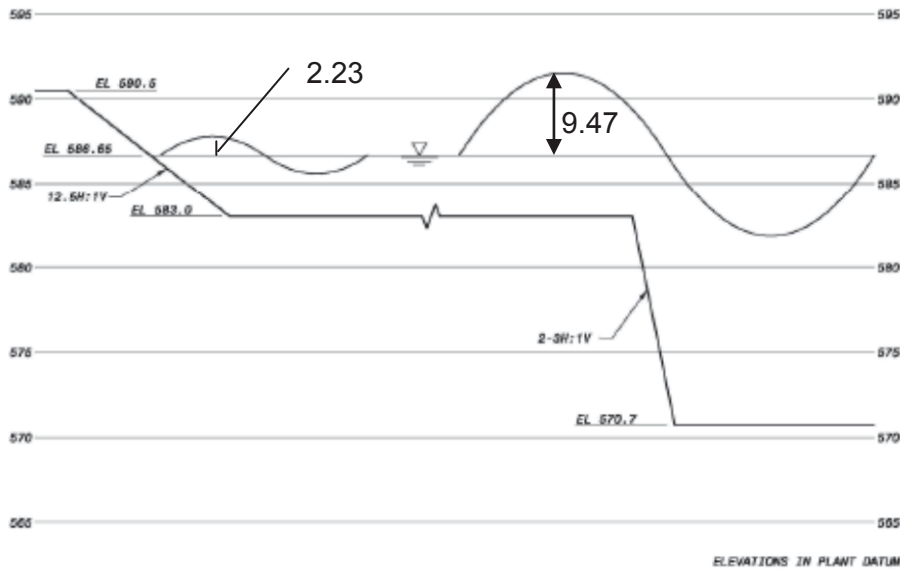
Characteristics of Breaking Waves at the Toes of the Seawall and Berm (Vertical Exaggeration, ~10:1; Elevation in Plant Datum).
